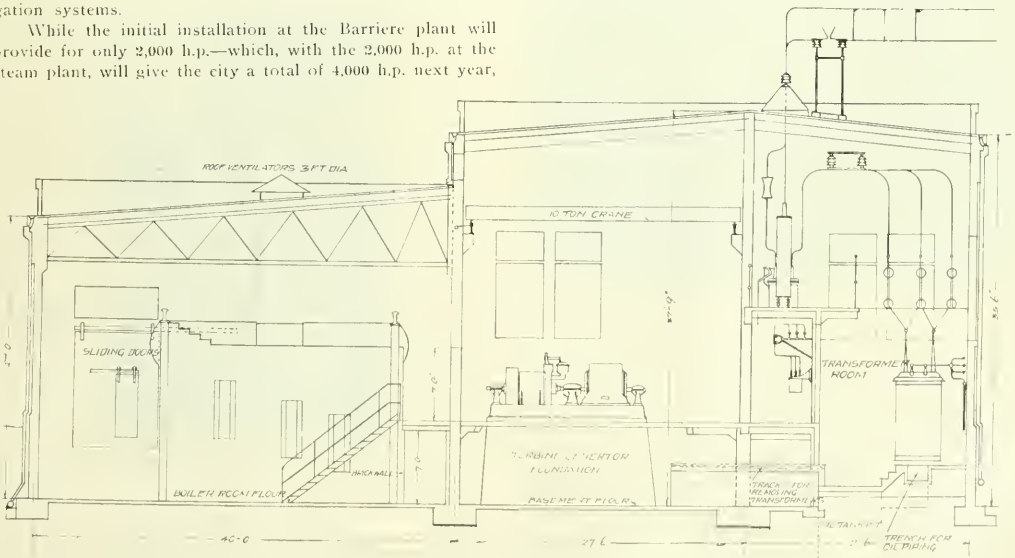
Section of Kamloops new steam plant—To be supplemented by hydro electric.
